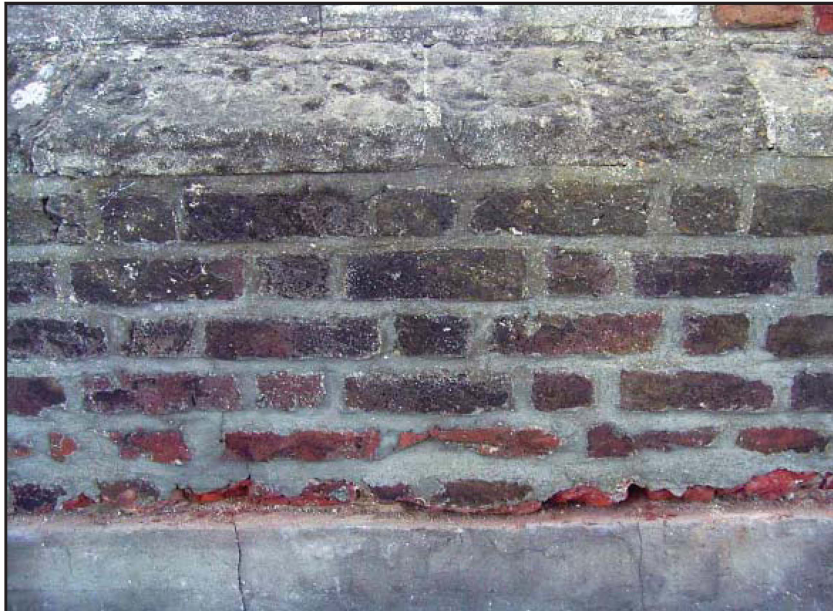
South parapet, internal face, illustrating 20th century rebuild
